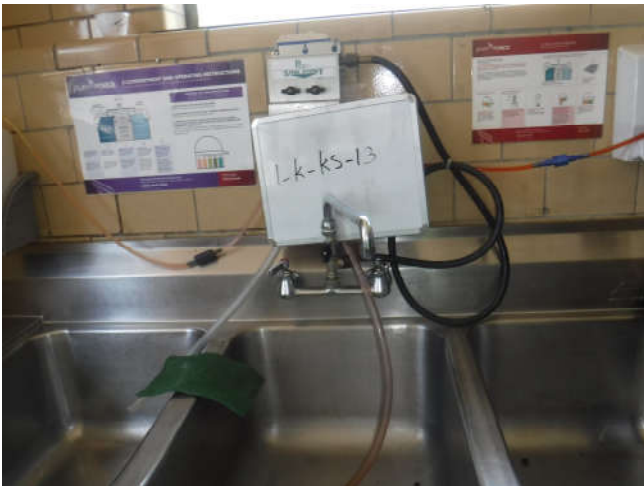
kitchen Faucet, located on 2nd floor in kitchen dish washing sink (Middle School)
